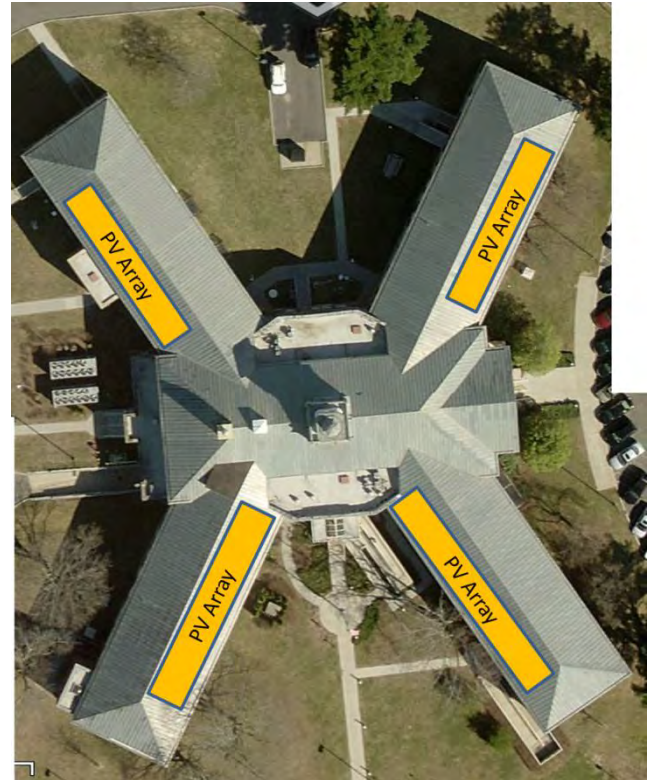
Roof of Old Home Infirmary with possible PV array arrangement.
